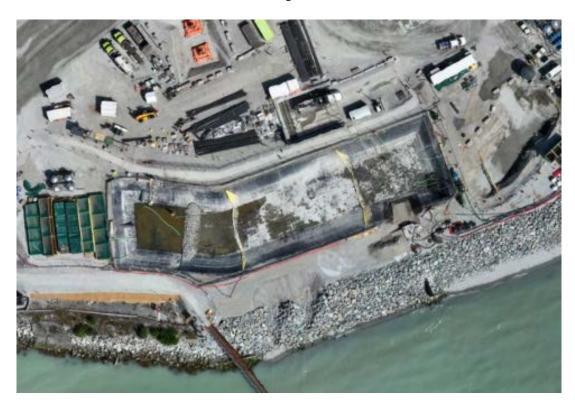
Aerial view of the West Sedimentation Pond (August 1, 2025). The West Sedimentation Pond was drained July 31 for cleaning and outfall pipe installation.
